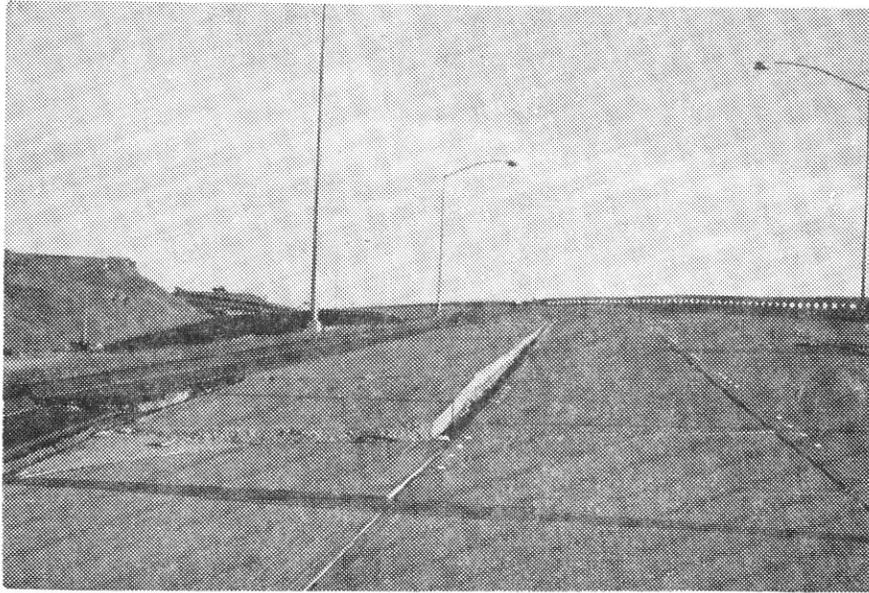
Looking southeasterly along Connector D-Y, at damaged fill-supported pavement.
